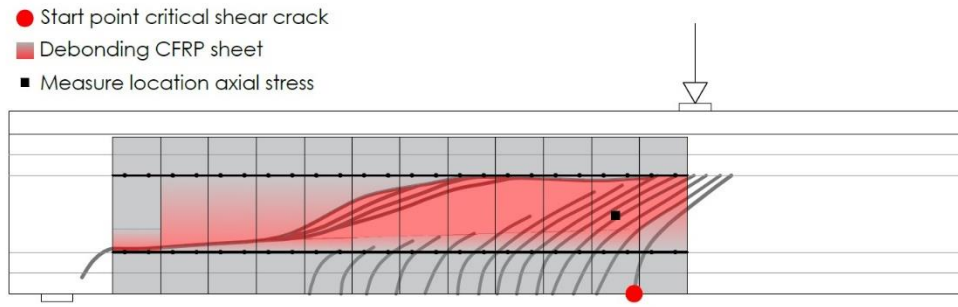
Crack pattern and CFRP debonding specimen I-VA-S0-SP4 at load step 147
